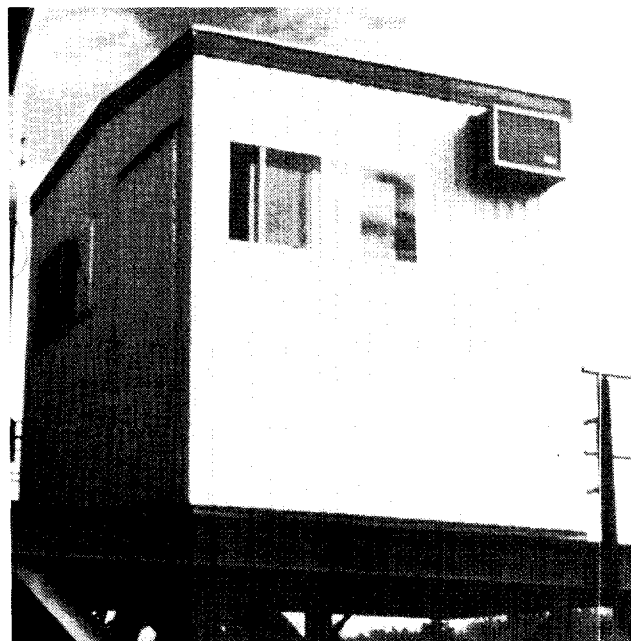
Operator control booth mounted on separate steel support structure.
